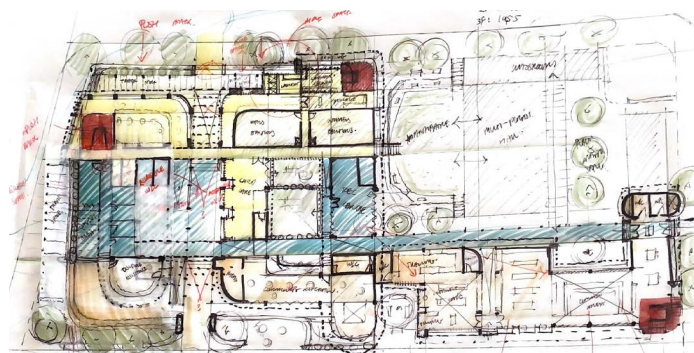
Floor plan development and initial spatial refinement (Author, 2023).
